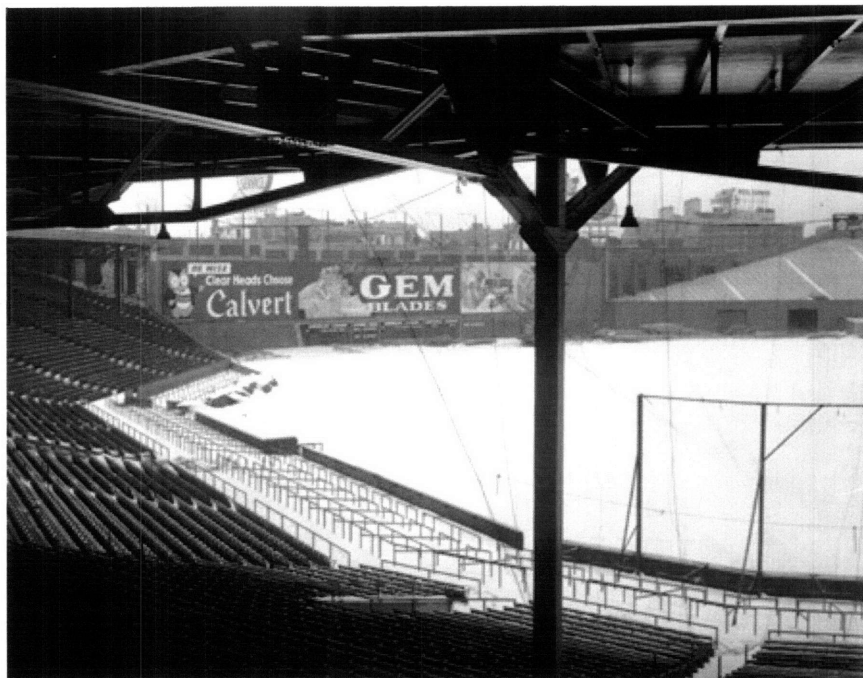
Steel columns and roof truss at Fenway Park [3]
